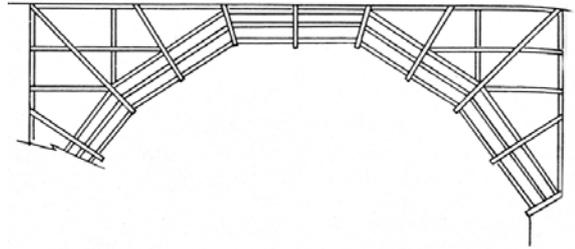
Design for a deck bridge supported by polygonal arch, Gautier, 1714. (James²)
